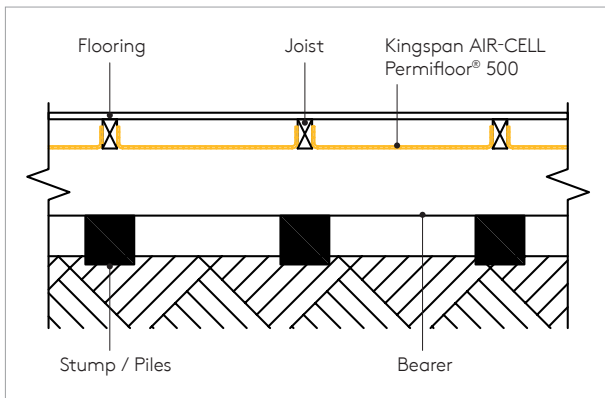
Side elevation of Kingspan AIR-CELL Permifloor® 500 in a suspended framed floor.
